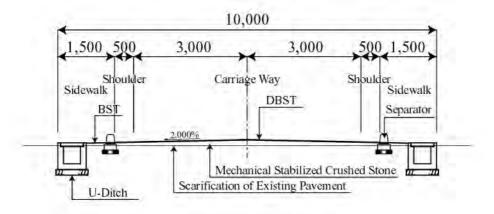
Standard Cross-Section: South Tarawa Road in Betio (2)
